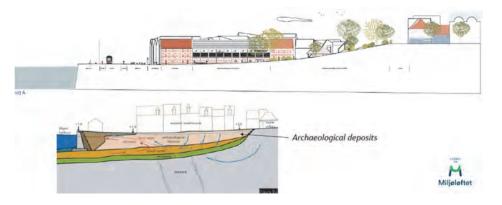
Foundation of the light rail tracks and relocation of underground infrastructure along Bryggen @Miljøløftet
